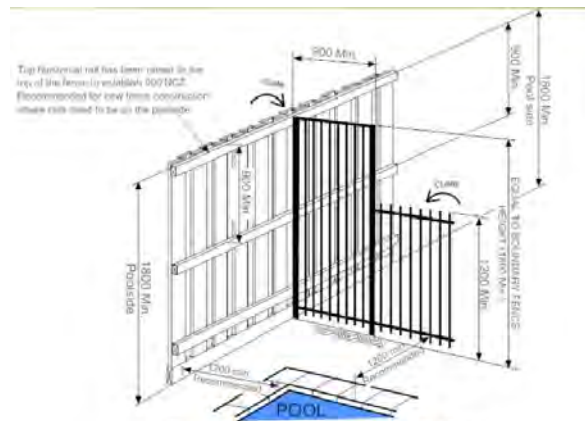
ALTERNATIVE BOUNDARY FENCE INTERSECTING A TYPICAL POOL BARRIER
